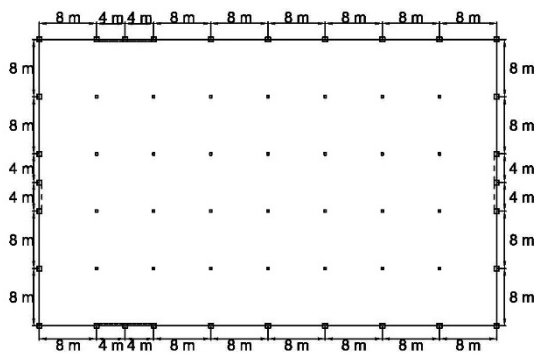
Plan view of the 12-storey structure associated with setbacks along the vertical axis of the building.
